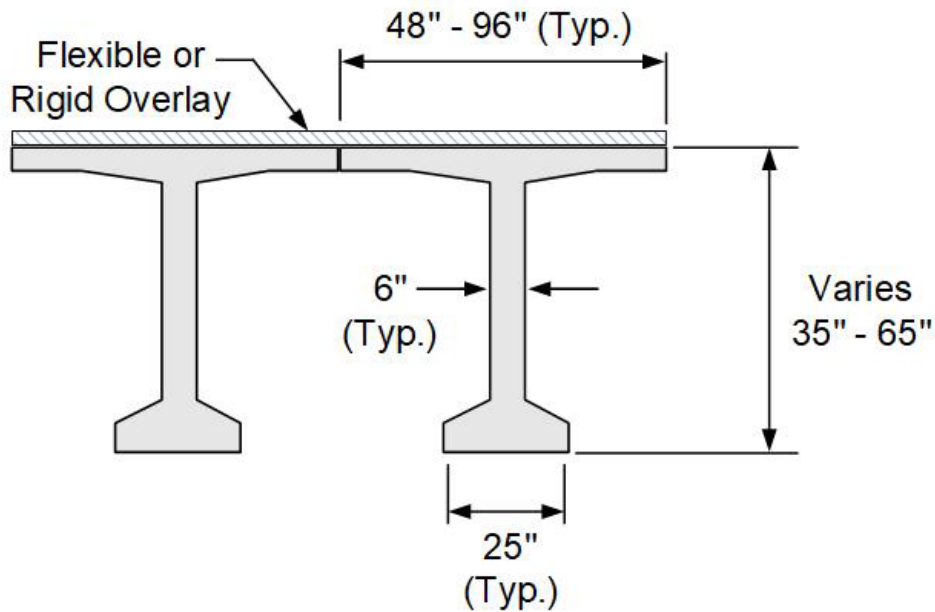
Cross Section - PCI Deck Bulb Tee Beam
